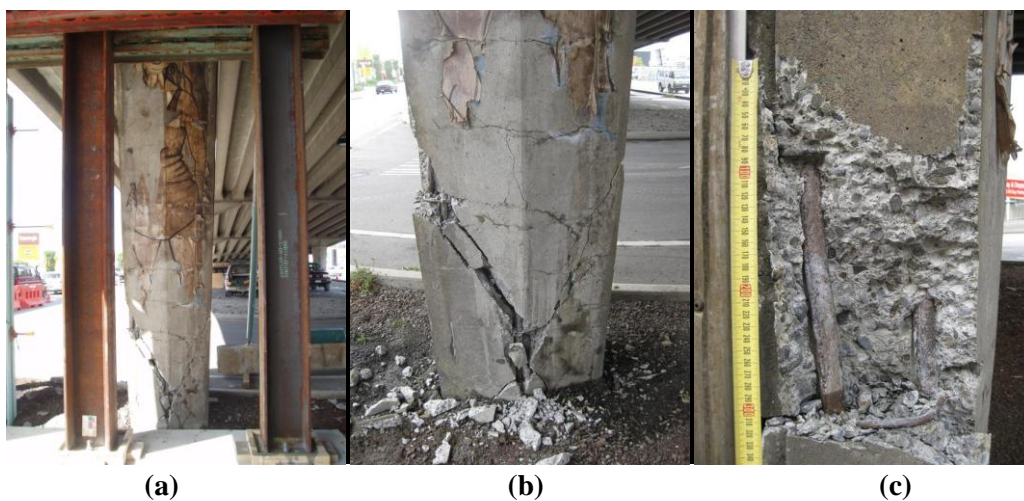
North column (a) West face (b) Detail of shear fail at the base of the west face (c) Exposure of the steel bars at the North face
